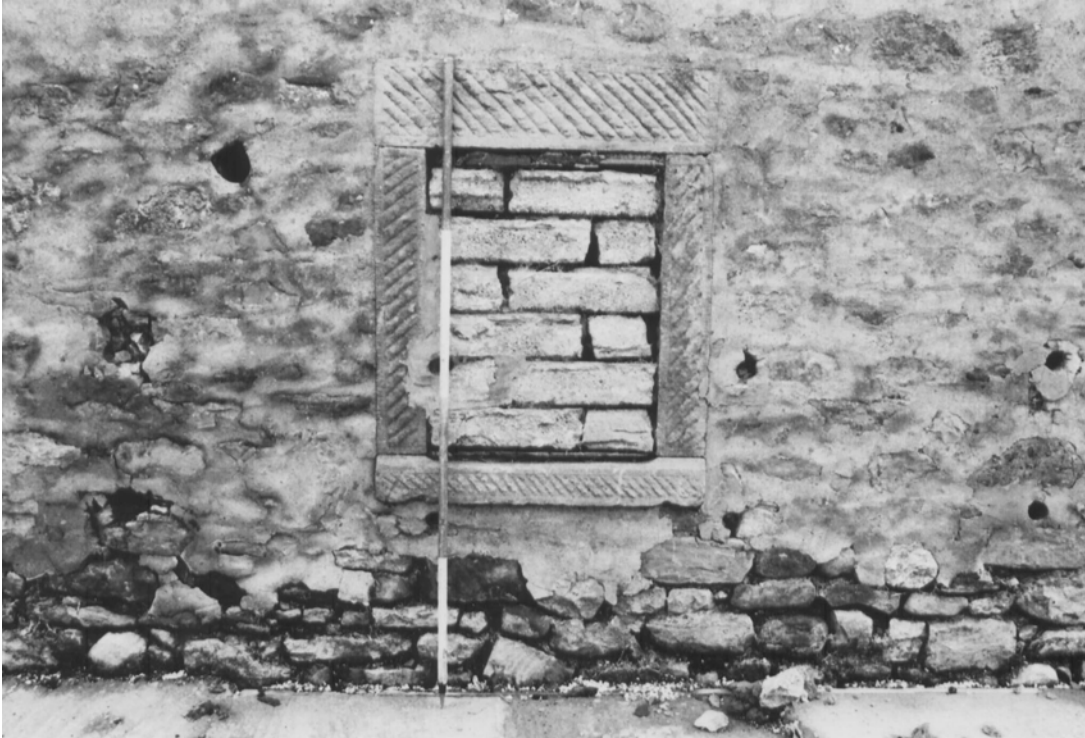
Detail of a blocked window on the west elevation, with the “rusticated” stonework characteristic of the building
